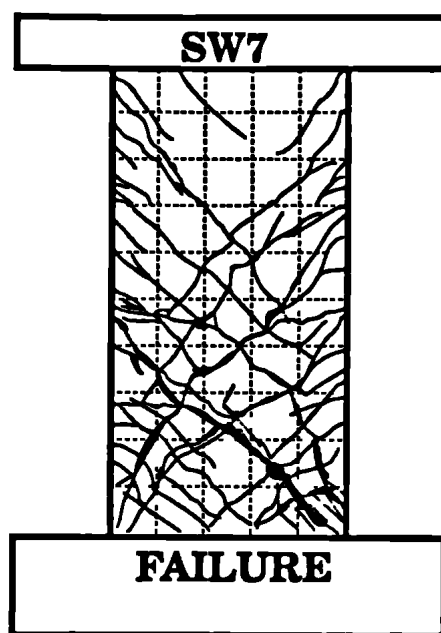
PilaSW7: DS4e - cracks at MDL-22 (failure due to bar fracture)
